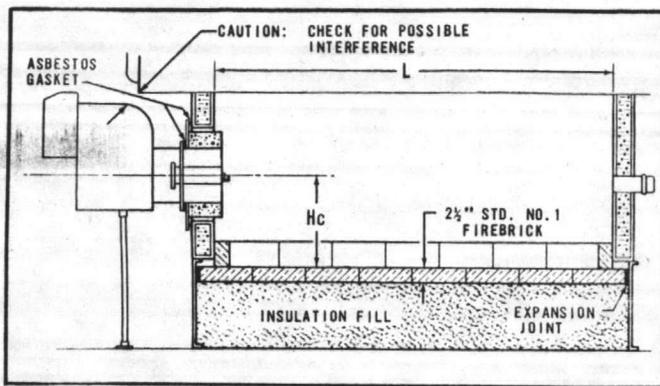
TYPE "R" BURNER INSTALLATION FIRING FIREBOX BOILER THROUGH THE DOOR
